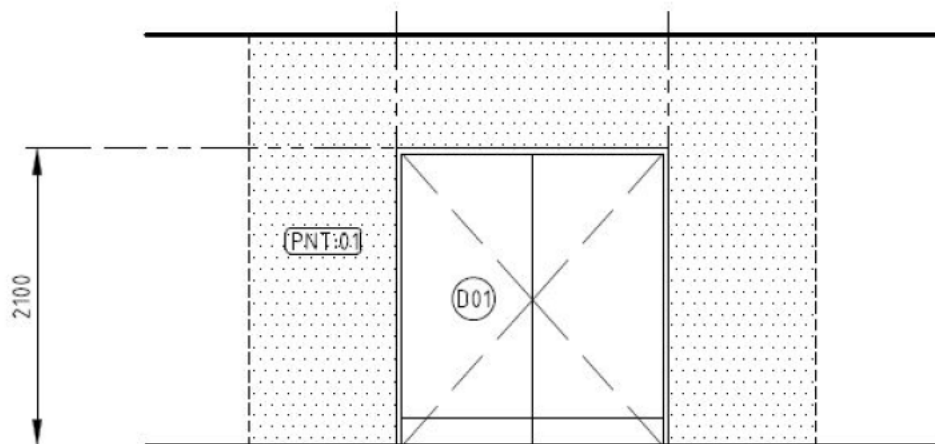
Proposed new entrance to storeroom. Source: Transport for NSW 2024
